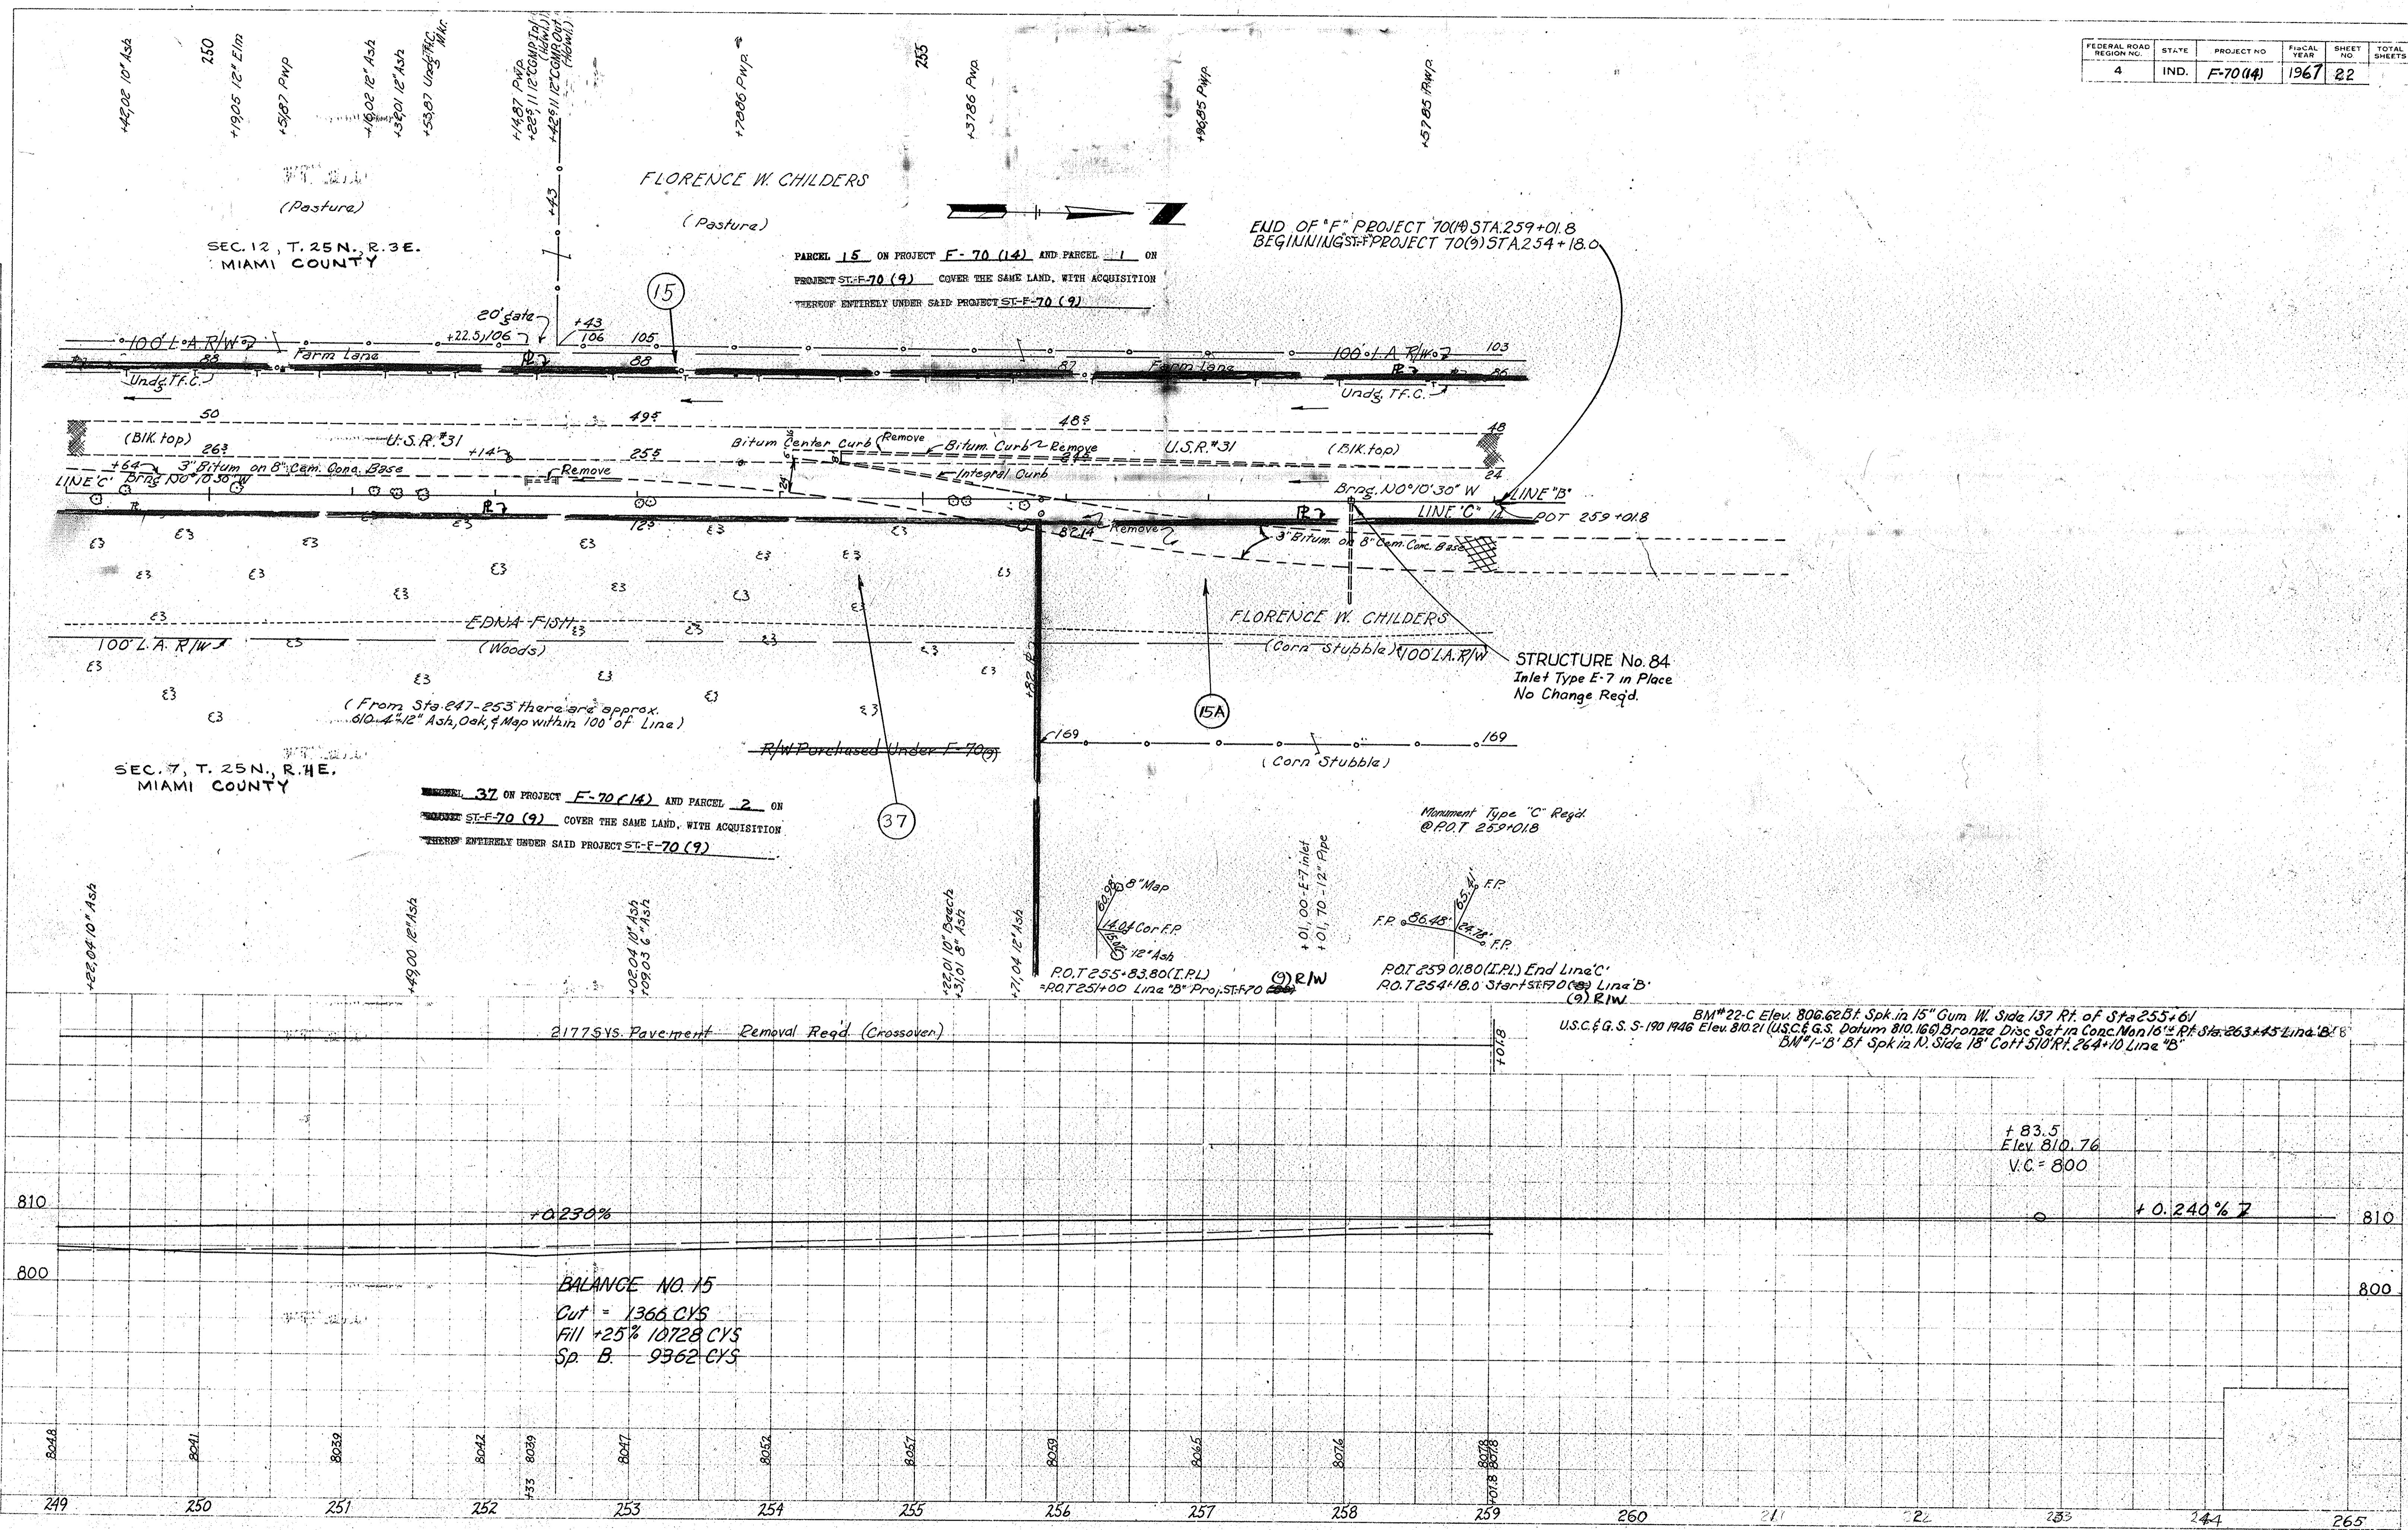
PLAN - PROFILE U. S. STANDARD
